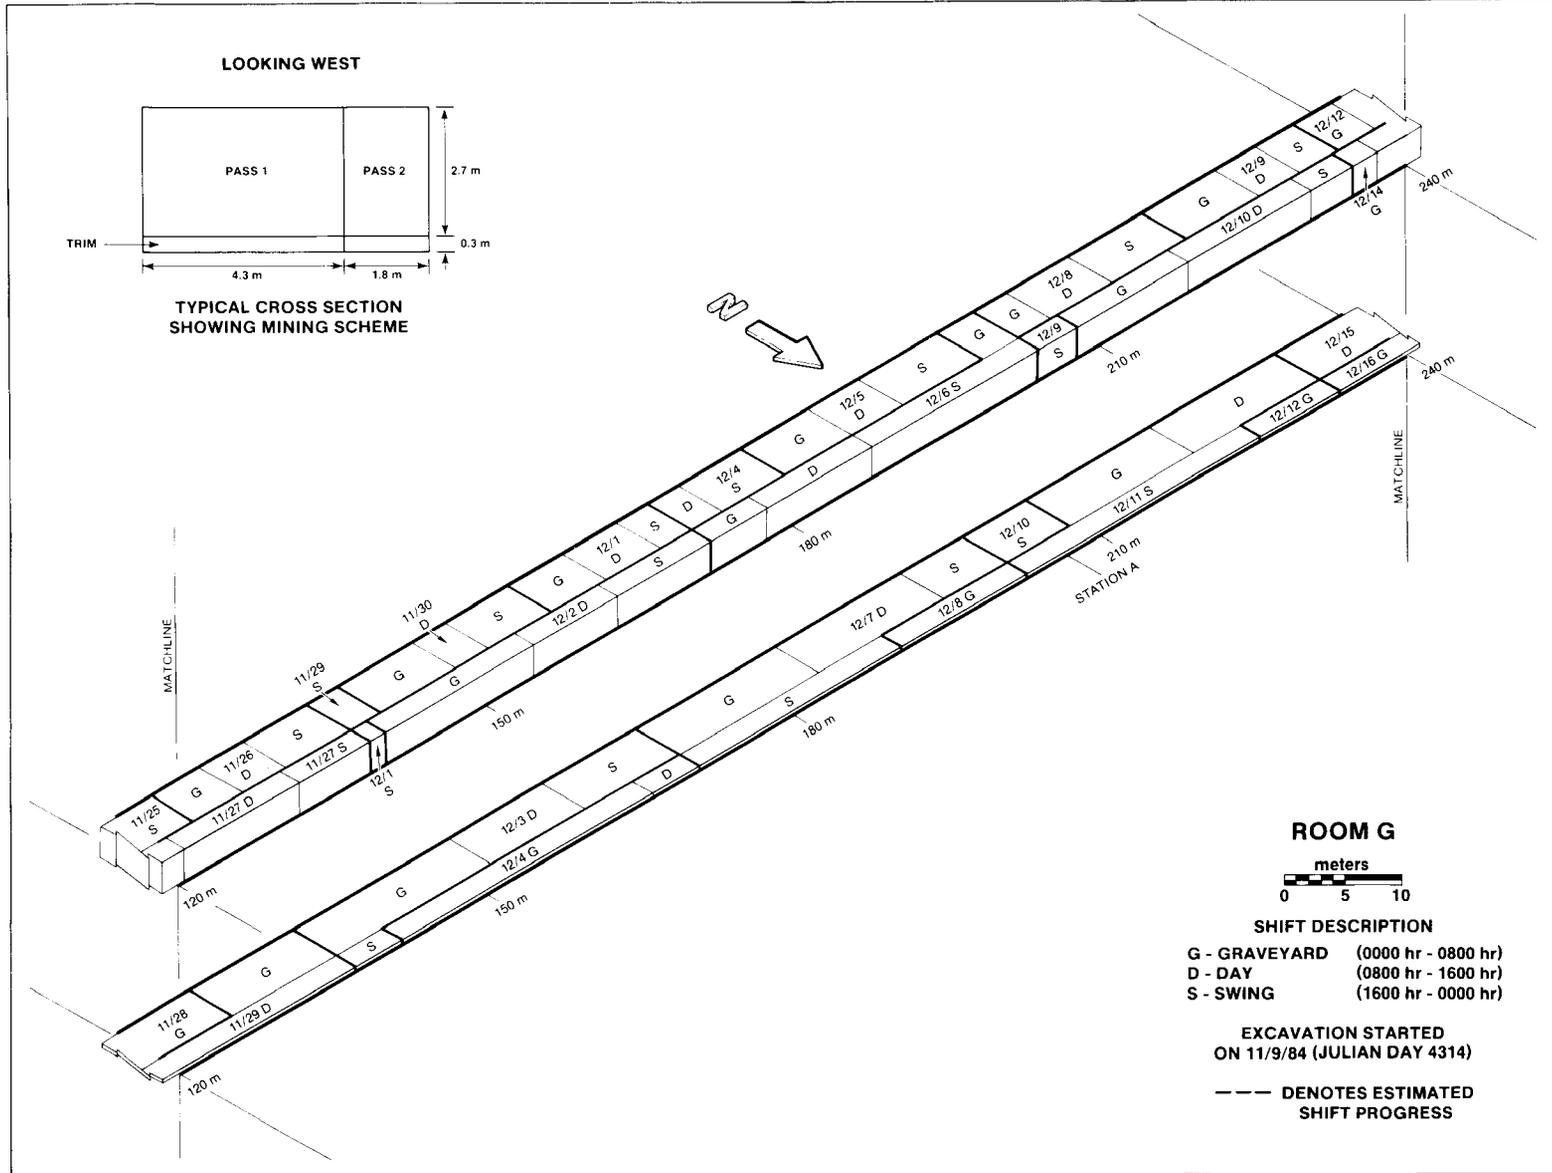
Isometric of Multipass Mining of Central Part of Room G
